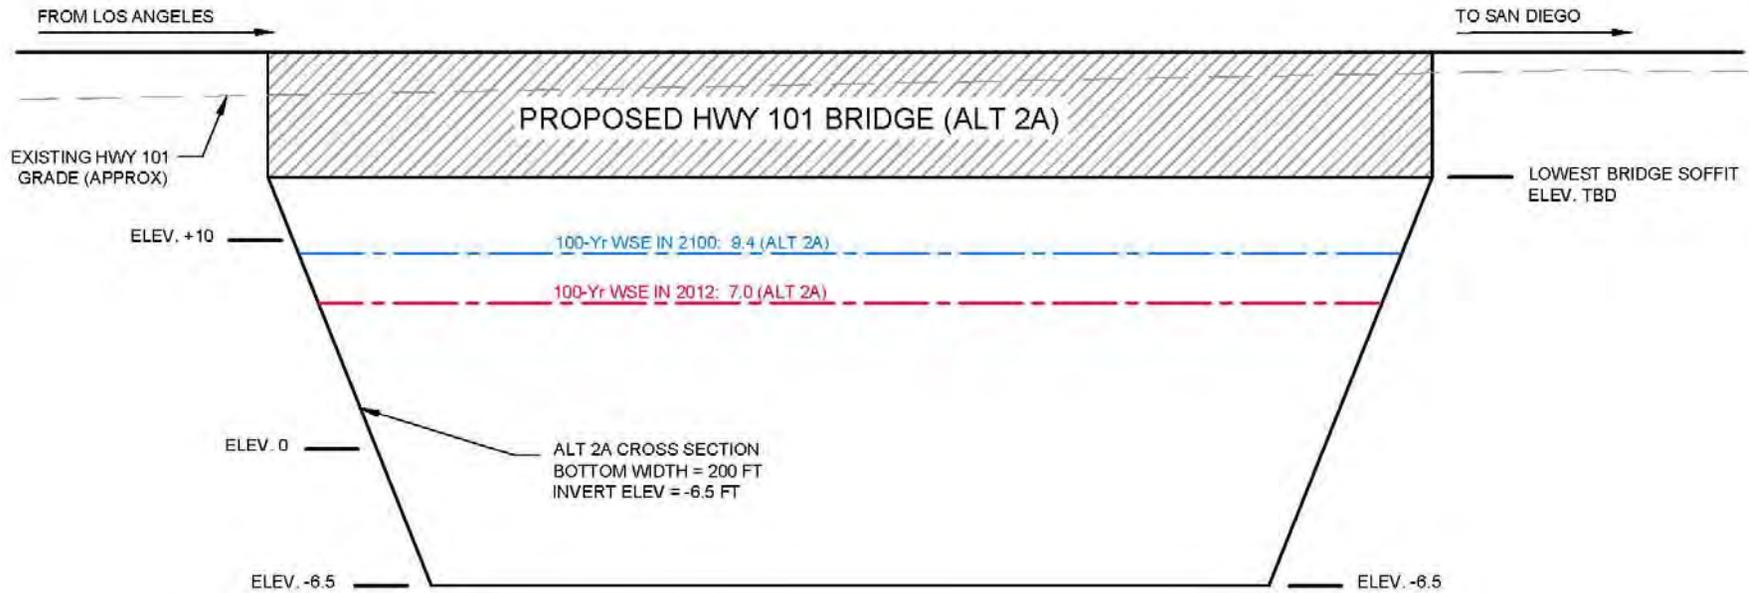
Proposed Alt 2A Highway 101 Bridge Channel Cross-Section
